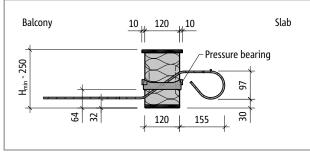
Schöck Isokorb® XT type Q-V1 to Q-V4: Product section
